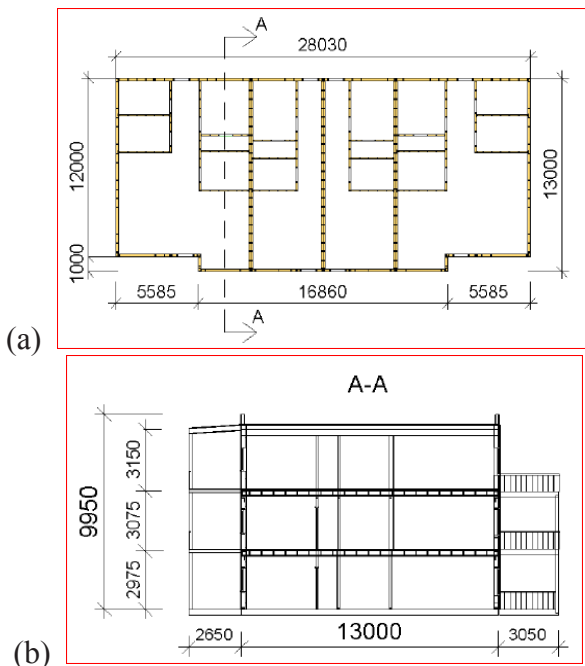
Plan (a) and cross-section (b) of considered three-storey building [8].
